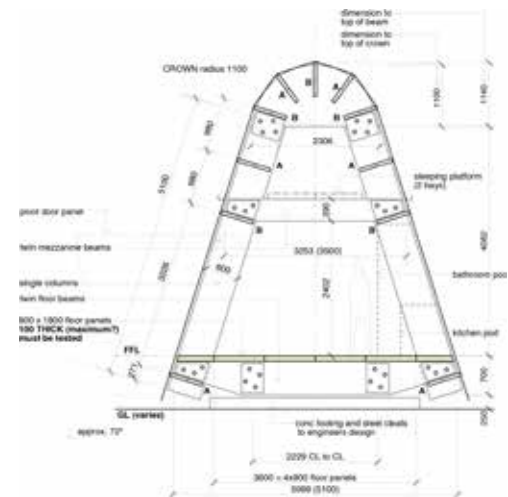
Cardboard House, Sydney, Australia, section, 2004
